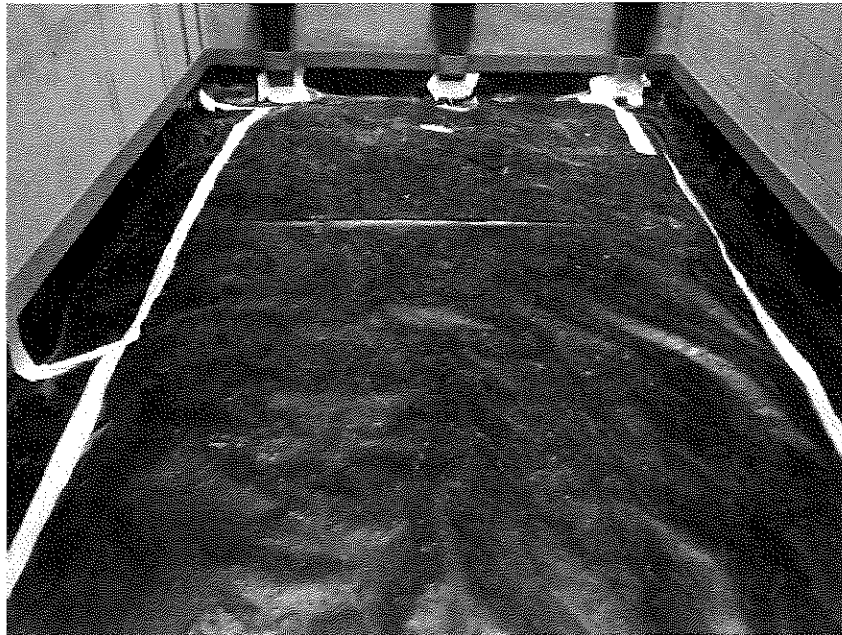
15-mil vapor barrier in process of being installed in north stairwell in north half of building with taped seams and perimeter (view to west; March 6, 2014).
